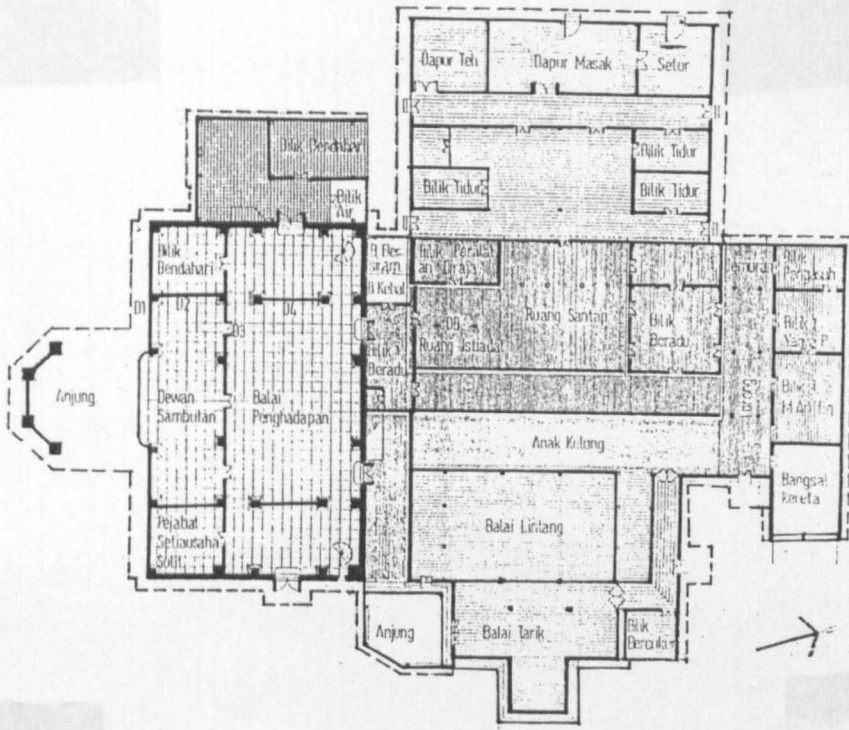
Floor plans of Istana Jahar after alterations.⁵⁶
